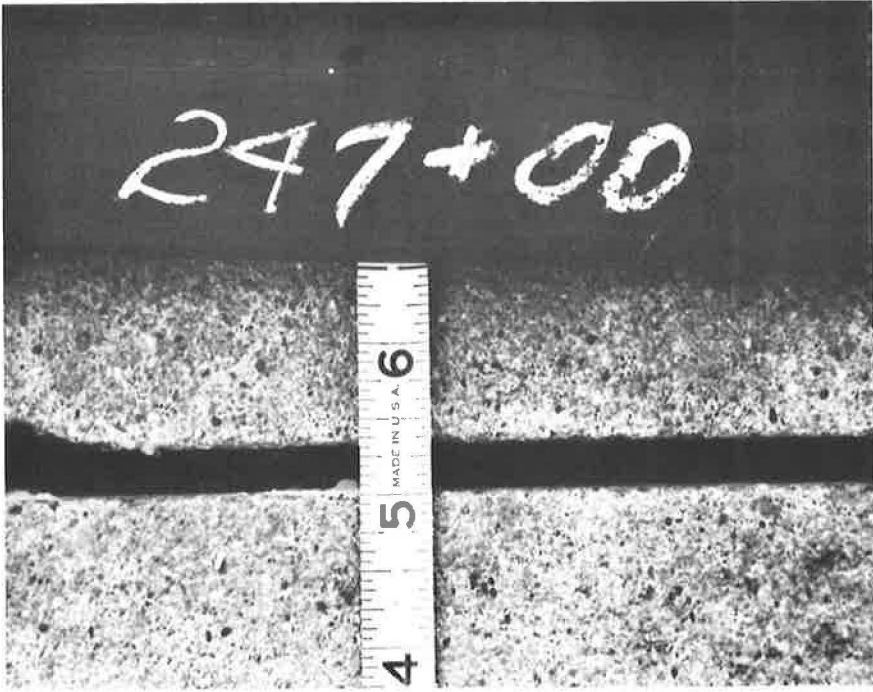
Example of type of photograph from which measurements of joint and crack openings were made.
